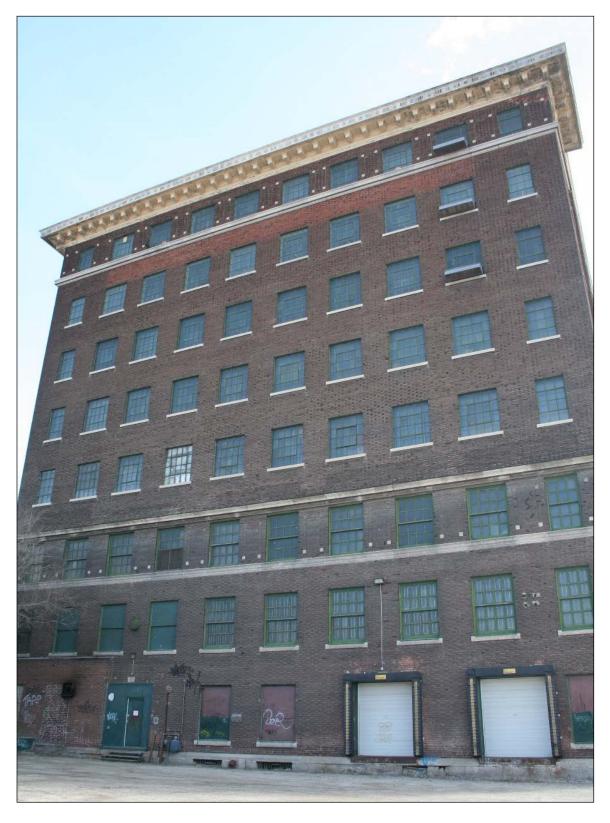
J.R. Watkins Company Warehouse, 90 Annabella Street, west façade, 2015. (\underline{M} . Peterson, 2015.)
